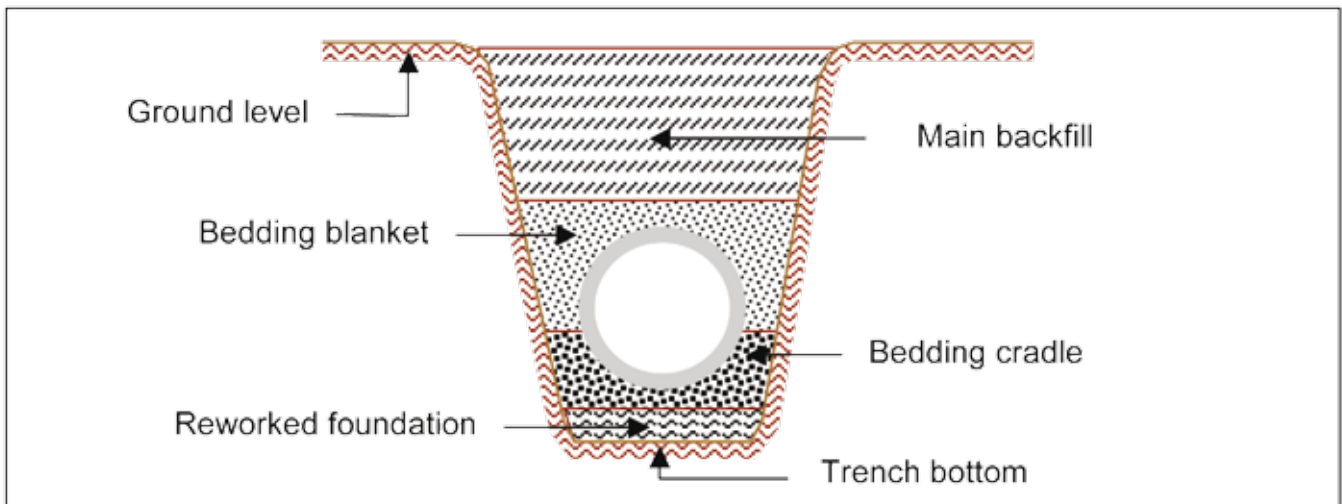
PIPE BEDDING AND INSTALLATION TERMINOLOGY
